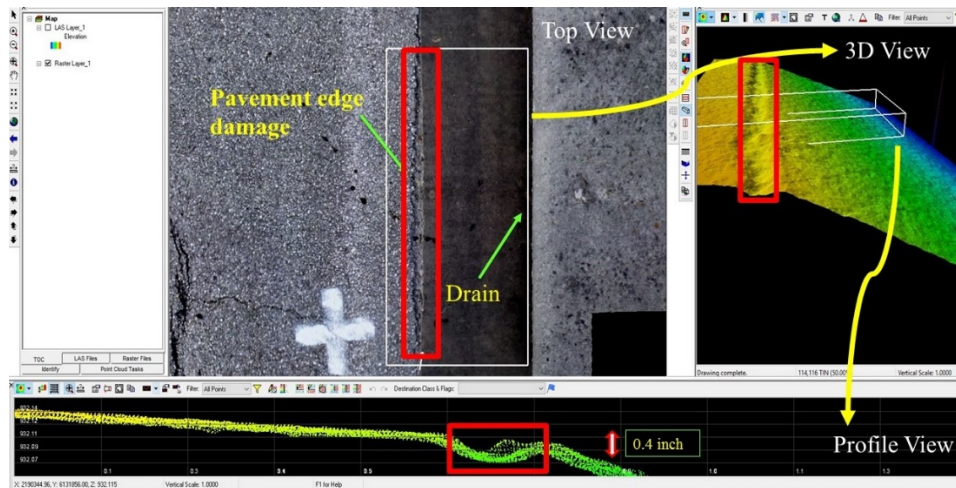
Pavement Edge Distress, Top View, 3D View and Profile View
